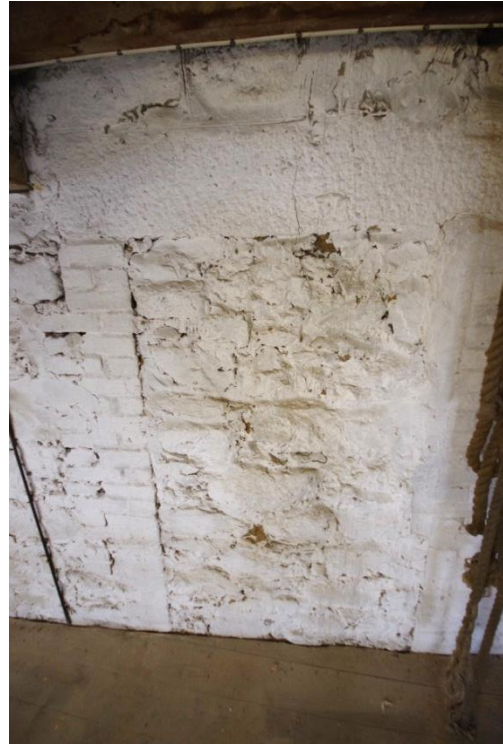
Room 11: Lower workshop (former store) blocked window opening in central part of west wall at mezzanine level.
